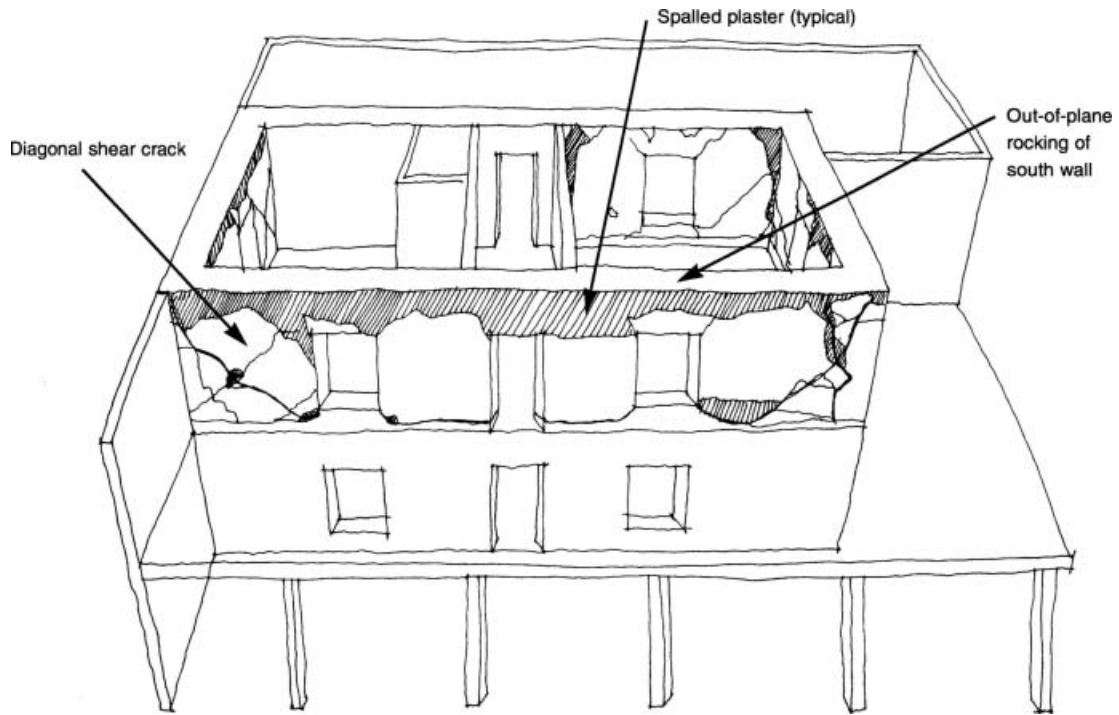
South side of the Leonis Adobe showing crack and spall damage.
